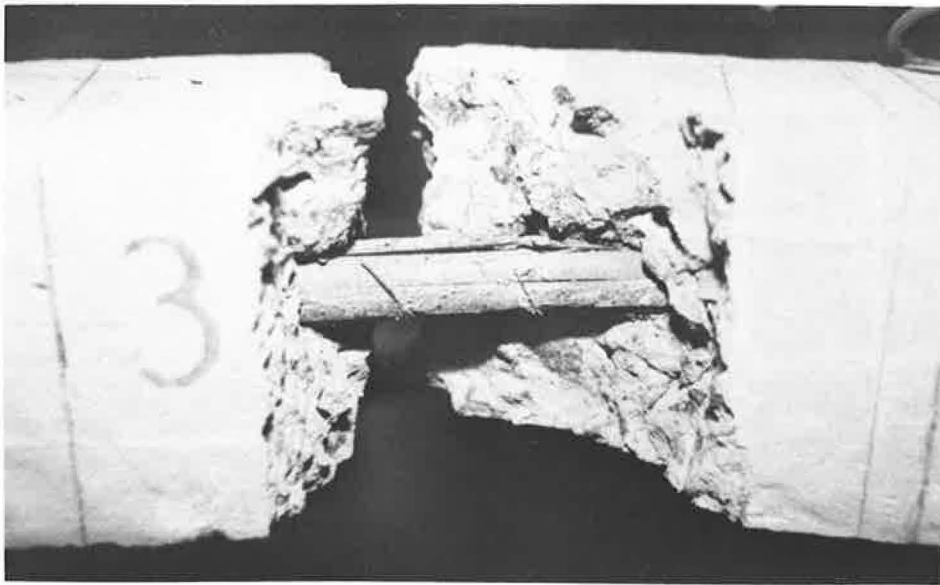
Failure Mode of Bamboo Reinforced Concrete Beam
